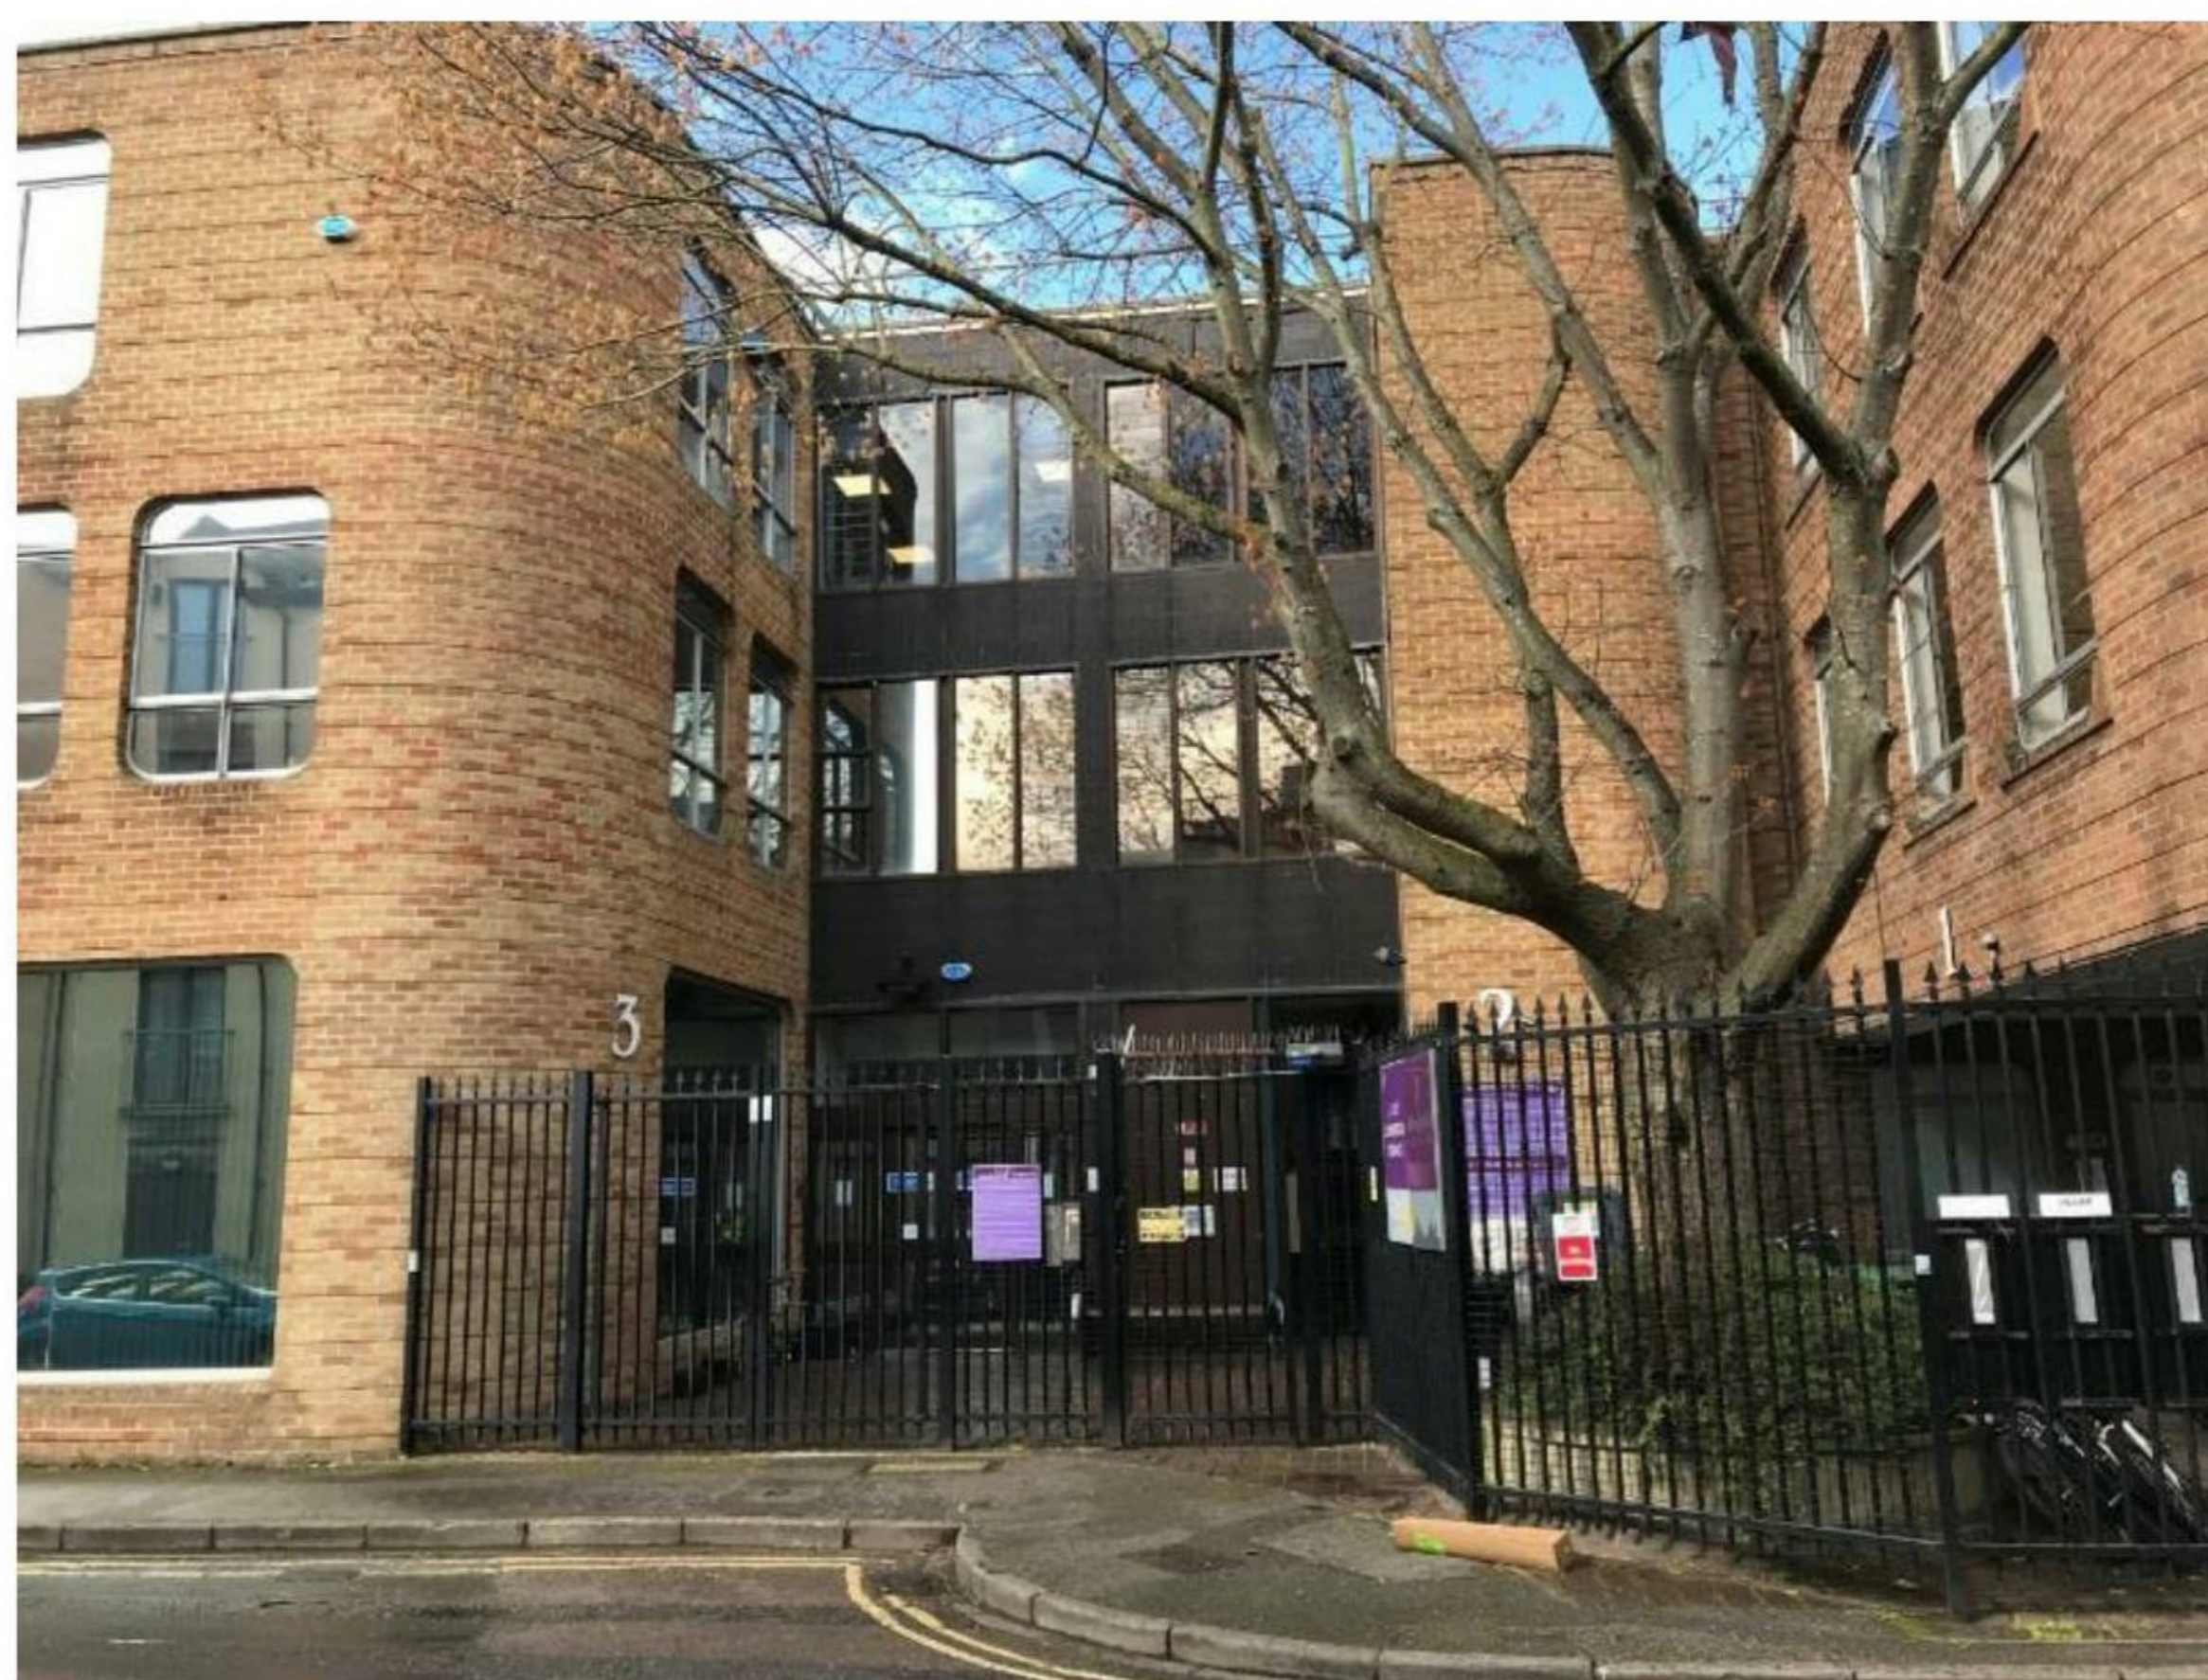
Metal railing outside the frontage of 2 and 3 Cambridge Terrace
